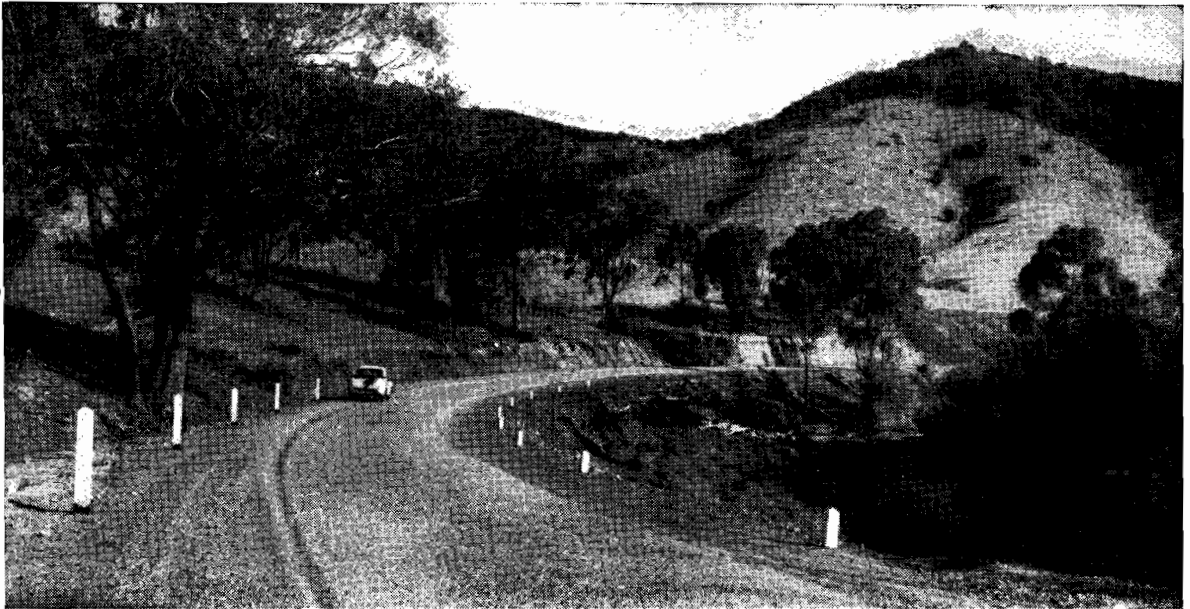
A reconstructed and sealed section of Omeo Highway at 22 miles near Swift's Creek.
